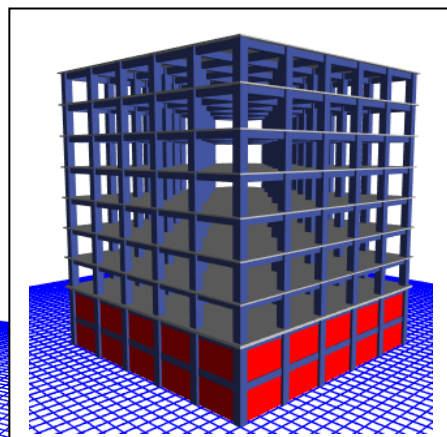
Model 2 (3D View of the RC wall in first storey)
